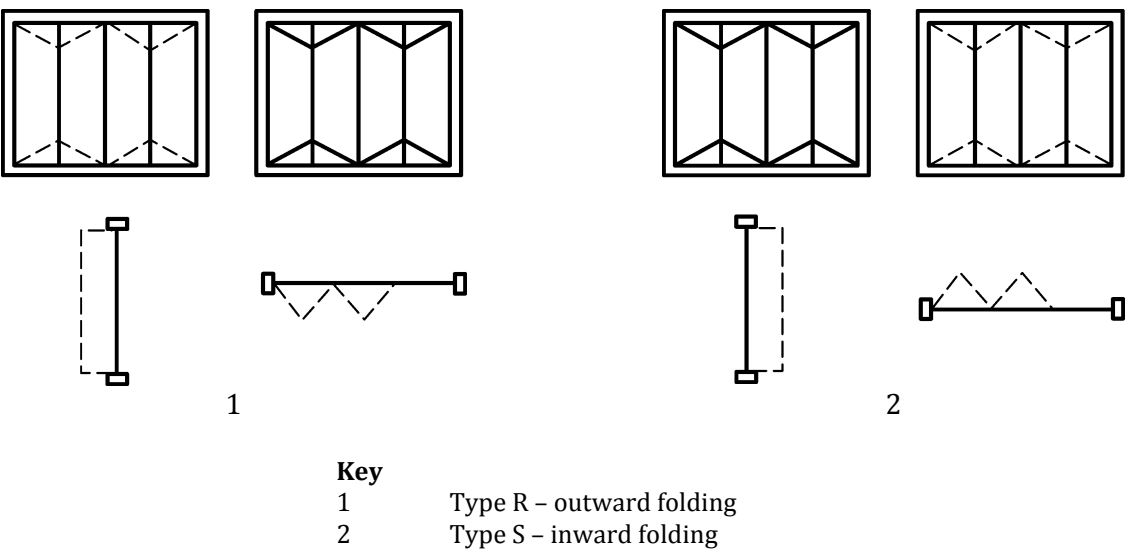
Type ‘R’ (outward folding) and type ‘S’ (inward folding) corner pivot windows
